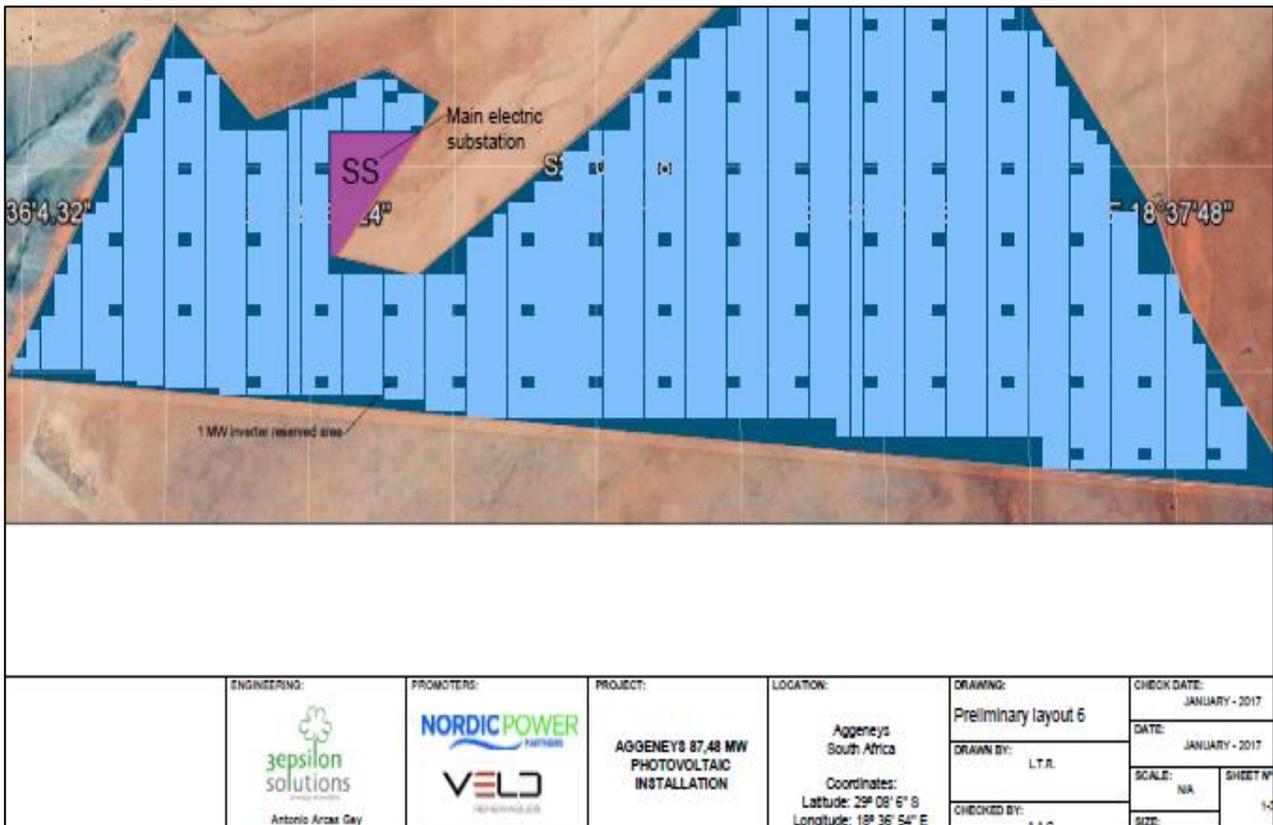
Preliminary layout plan of the proposed facility on the Haramoep (new north) site.
